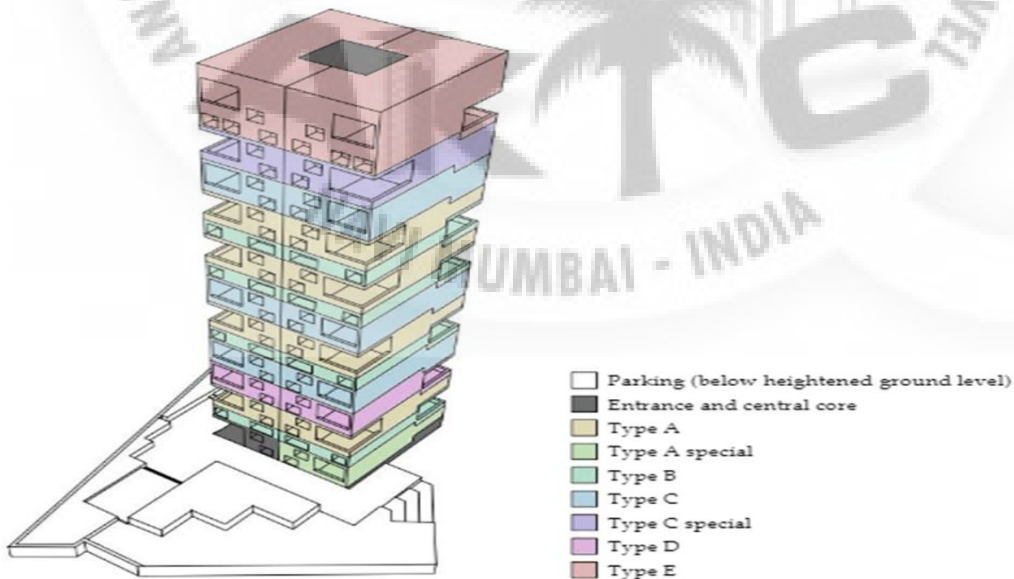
floor plates Kanchenjunga Apartment (Source- issuu)
